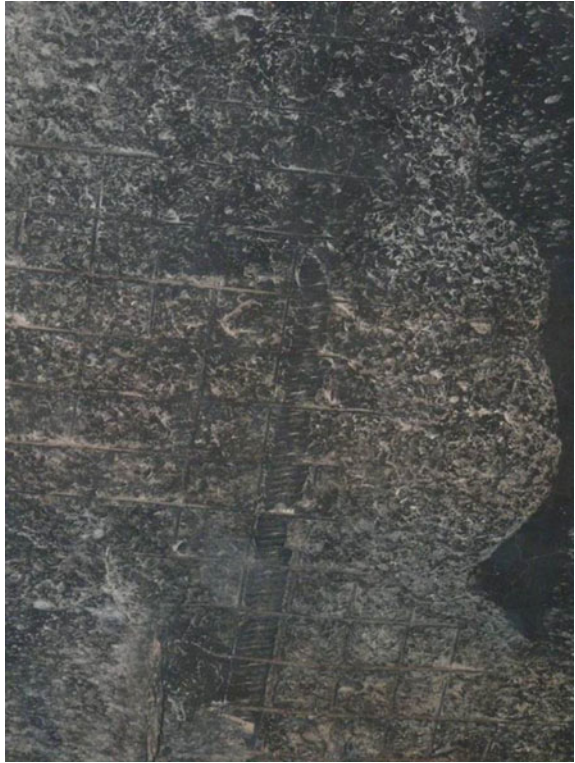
Fire broke out in basement 1 floor, it got damaged and it passed through the ramp opening and affected the first floor slab and soffit of the second floor slab (there is 4 m cantilever in second floor slab)
